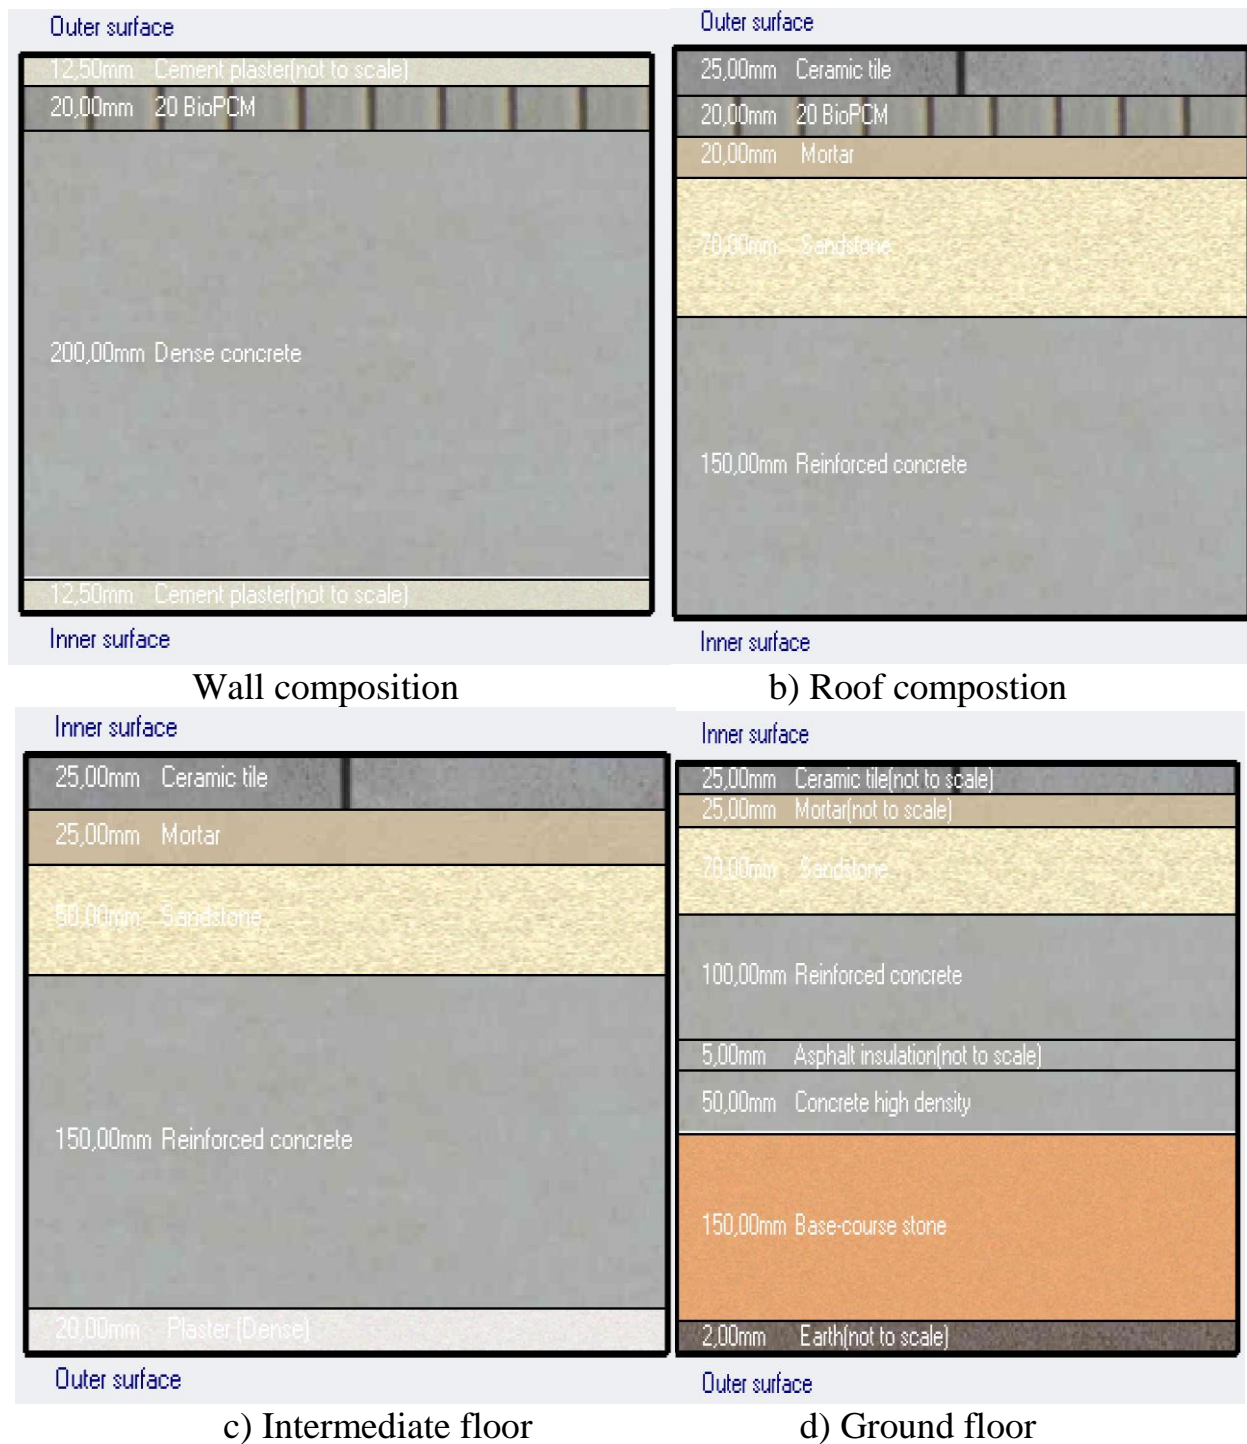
Details of Wall, Roof, Intermediate and ground floor
